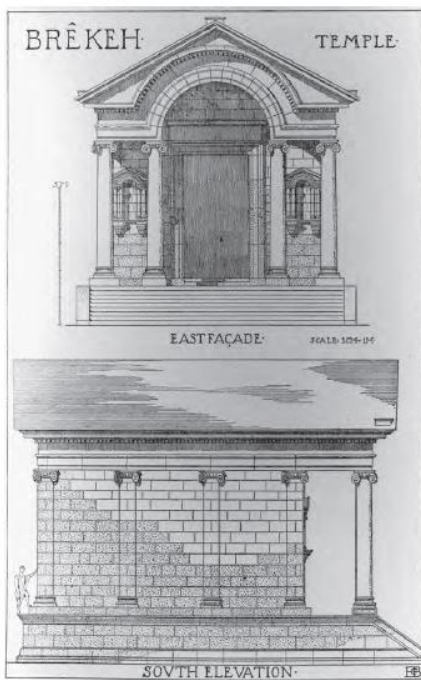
Plate XXV Brêkeh: east façade and south elevation of the temple, suggested reconstruction. From *PLAIES H.A.7* (1919), pl.XXIX.
